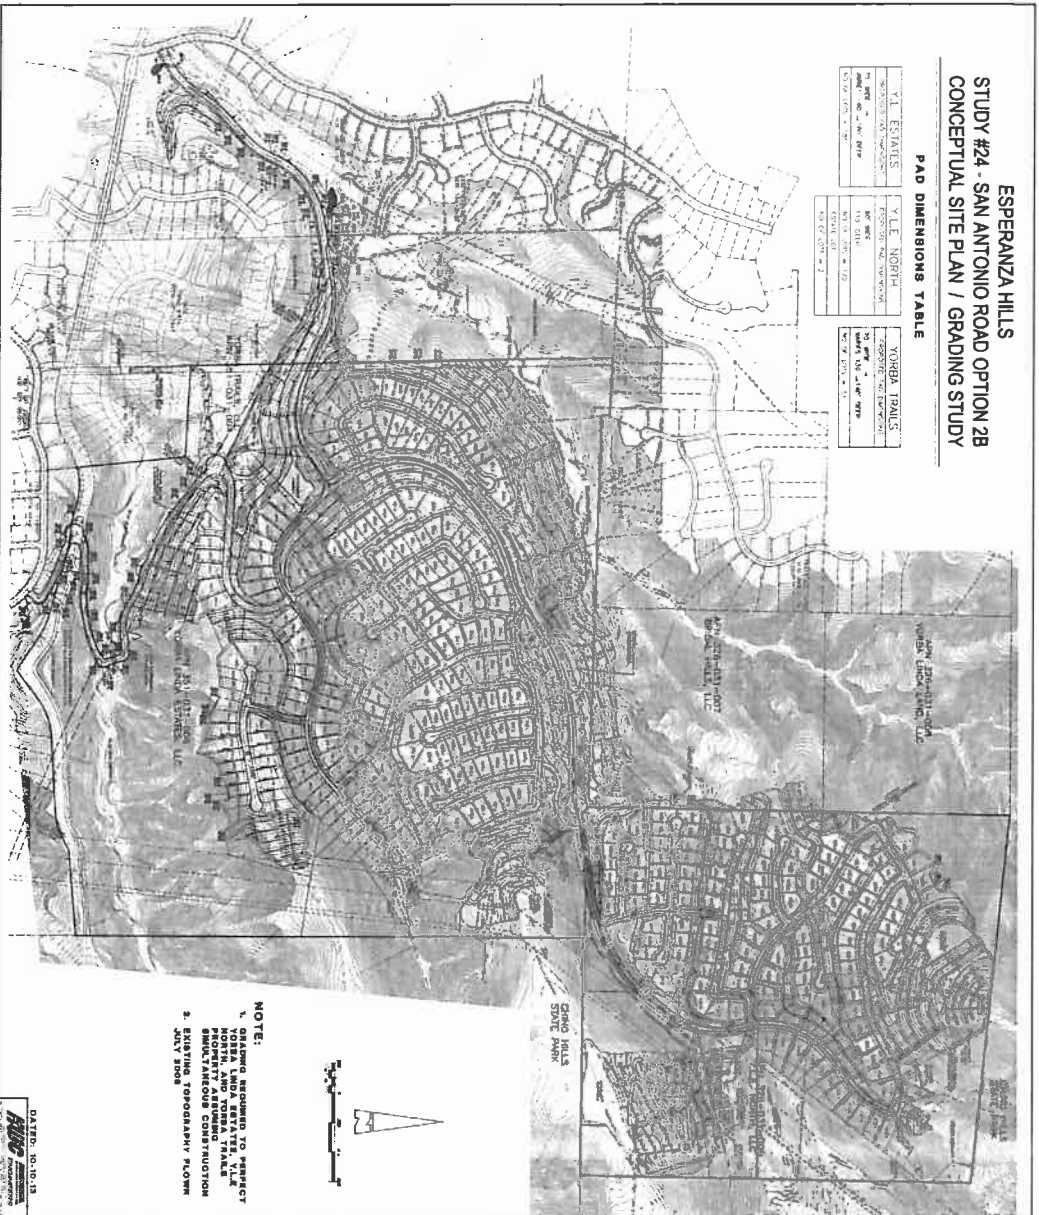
Conceptual Site Plan, Option 2B
